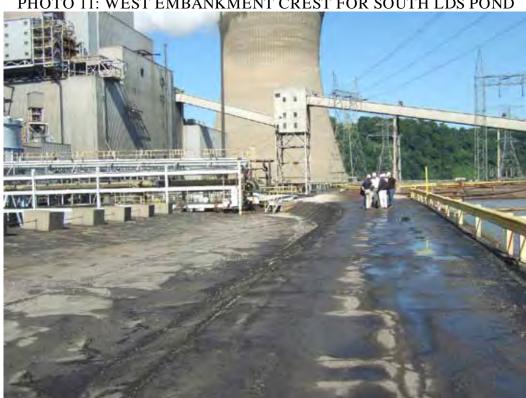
WEST EMBANKMENT CREST FOR SOUTH LDS POND
